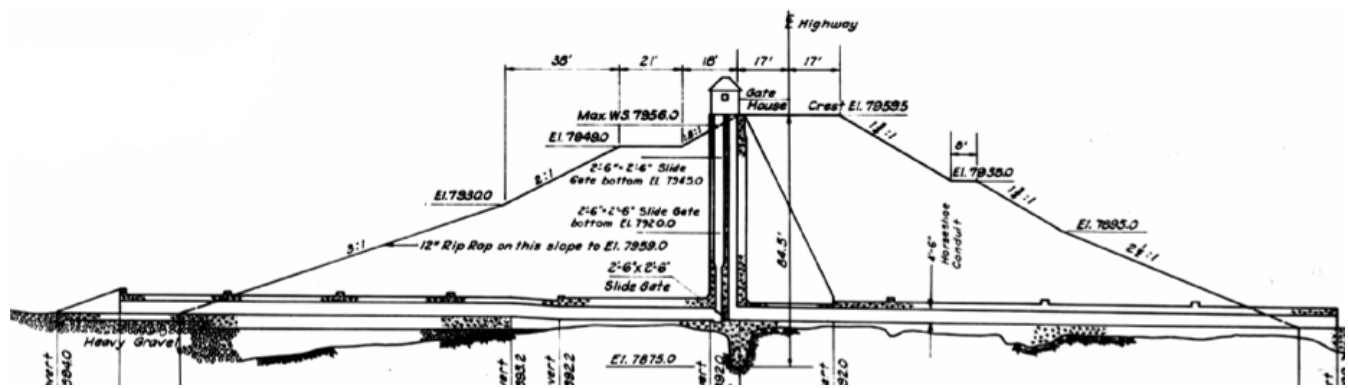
Caples Lake Main Dam cross-section showing gate house gate shaft, gate locations, and conveyance conduit.
